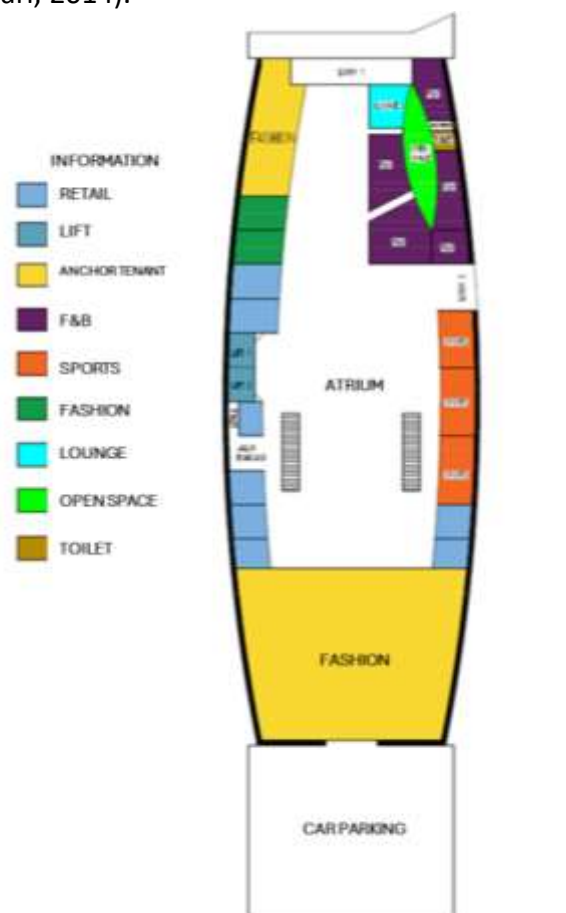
Royal Batam Mall Ground Floor (GF) Schematic Plan
